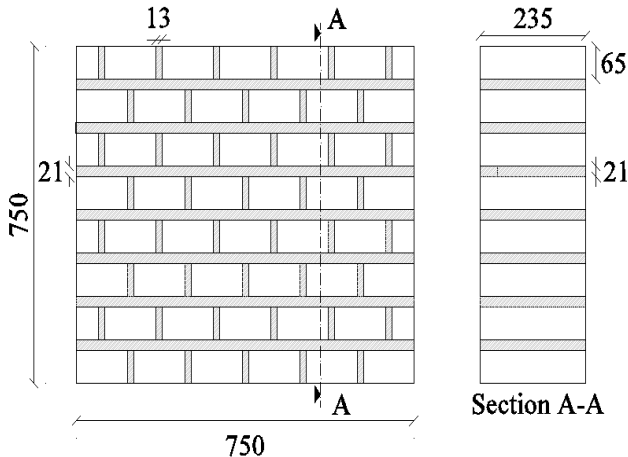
The configuration of the masonry wall specimen with geometric features (dimensions in mm)
